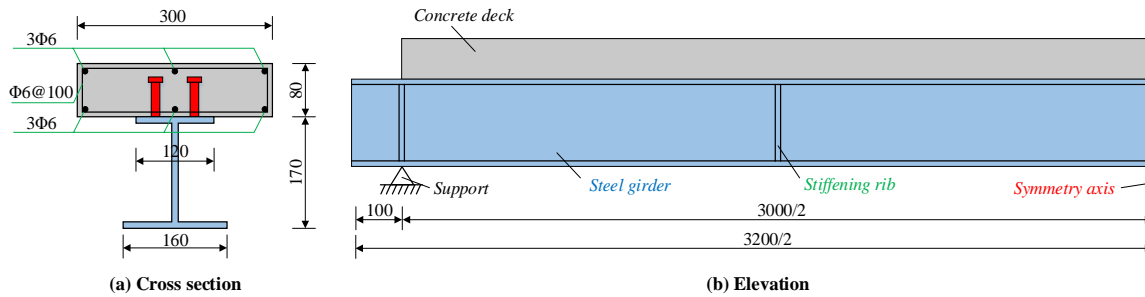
The size and construction of composite beam specimens (Unit: mm)
